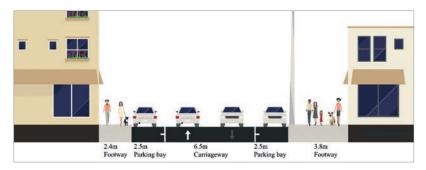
High Street Existing (with side street parking) (© Street Mix)
